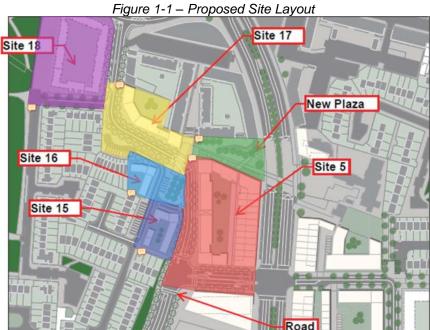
Site Plan outlining Sites 5, 15&16, 17, 18
